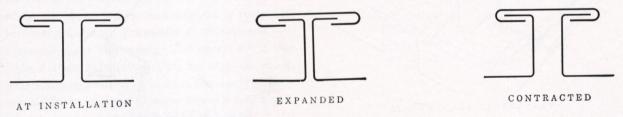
Expansion joint detail, for use with pan type roofing.
